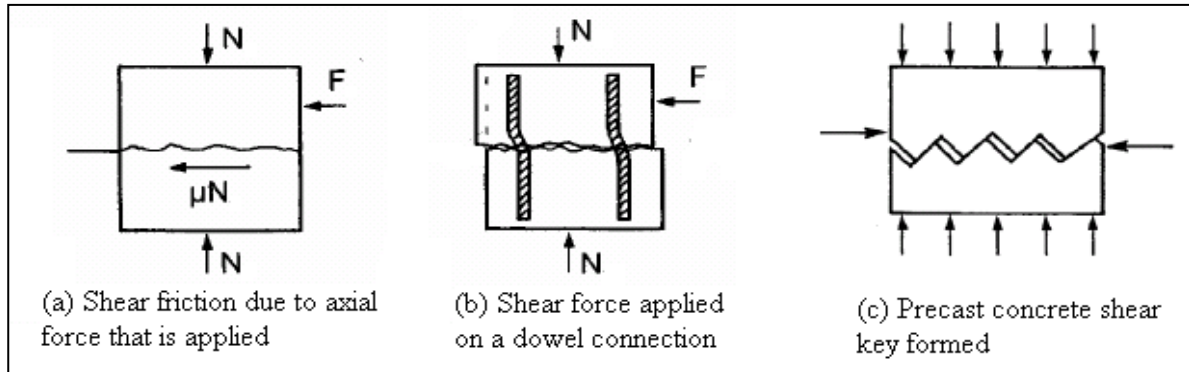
Identification and illustrations of shear found in typical precast connections (Walraven 2013)
